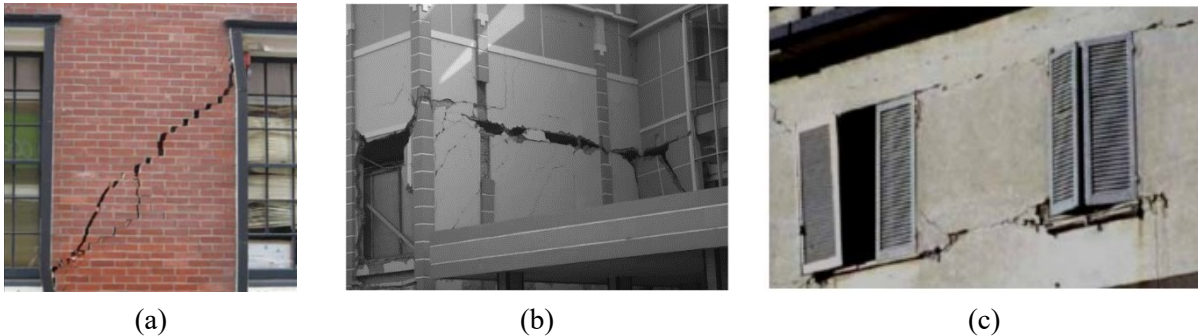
Failure modes of masonry walls under IP loading: (a) diagonal tension cracking (Celano et al. 2021), (b) shear sliding (Saatcioglu et al. 2006), and (c) flexural rocking (Celano et al. 2021)
